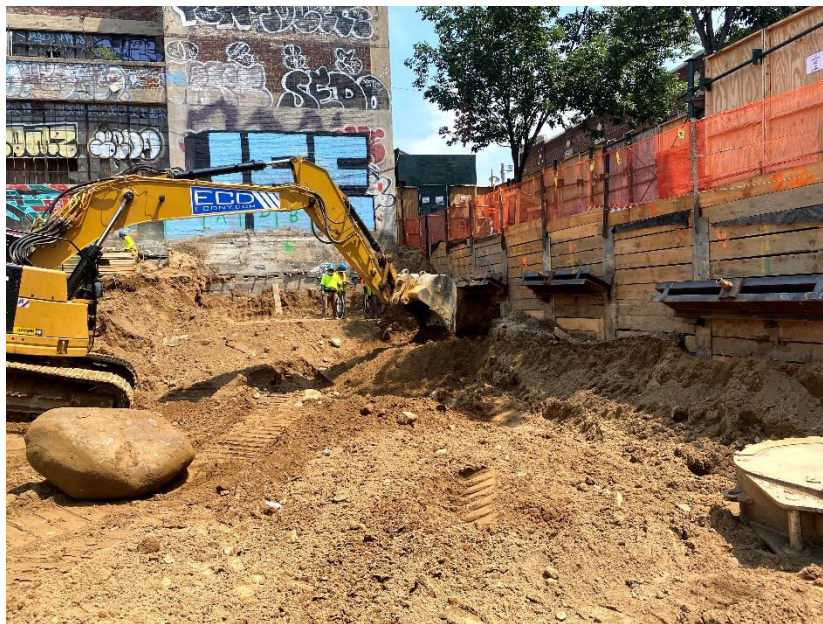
View of ECD excavating for installation of lagging in the southeastern part of the site, facing southeast.
